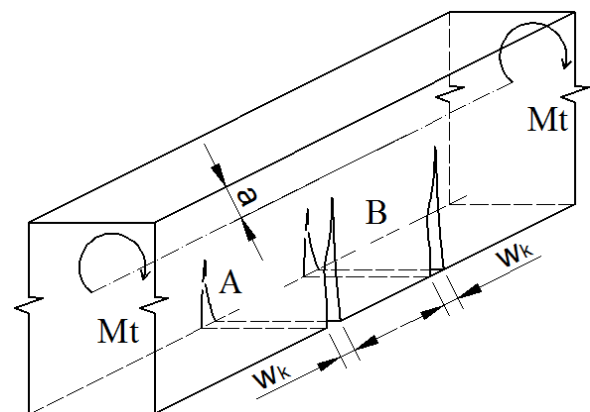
Scheme of reinforced concrete element with normal crack, which is loaded torque
